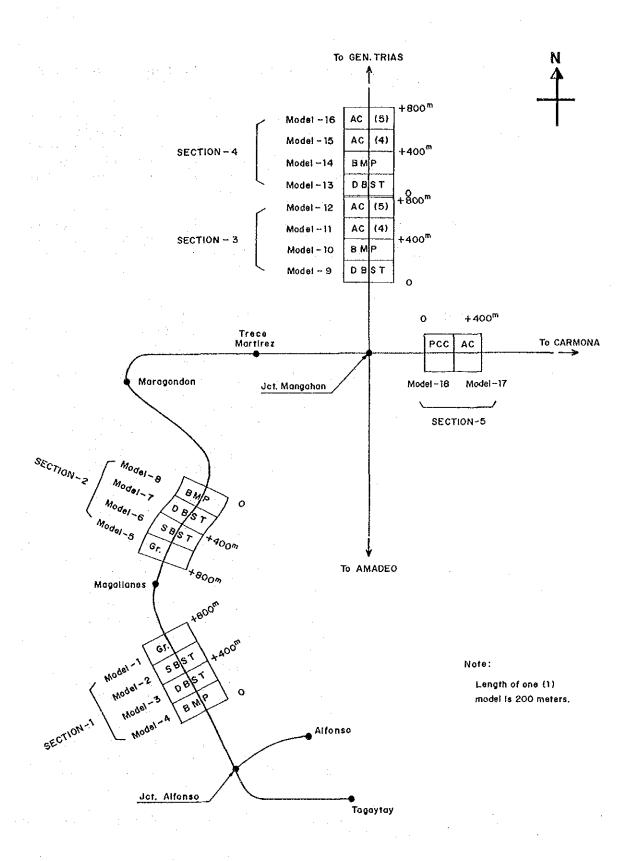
LOCATION OF PAVEMENT MODELS
